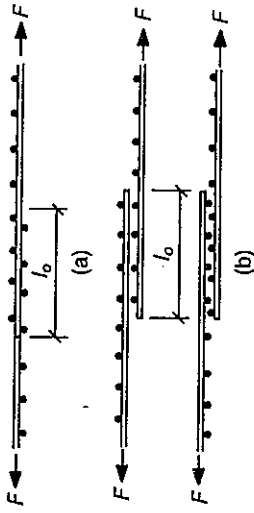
Lapping of welded fabric: (a) intermeshed fabric (longitudinal section); (b) layered fabric (longitudinal section)
